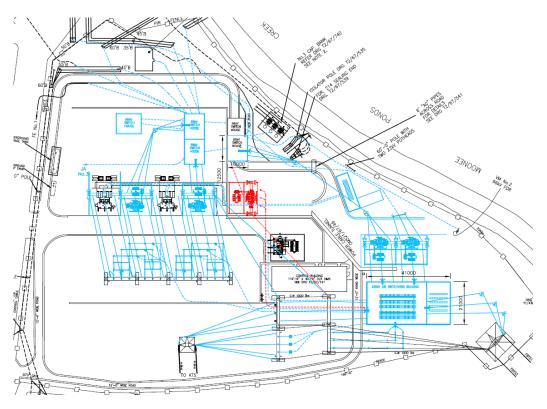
WMTS Site Layout for the Approved WMTS Redevelopment Plan
